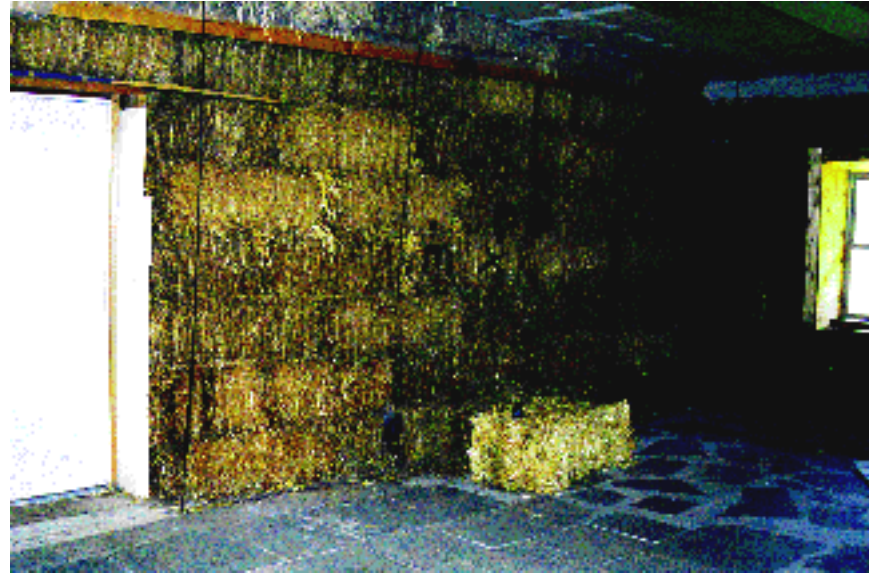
, showing non-load-bearing wall marked for in-situ bale replacement. This wall is stuccoed only on the outside surface.
